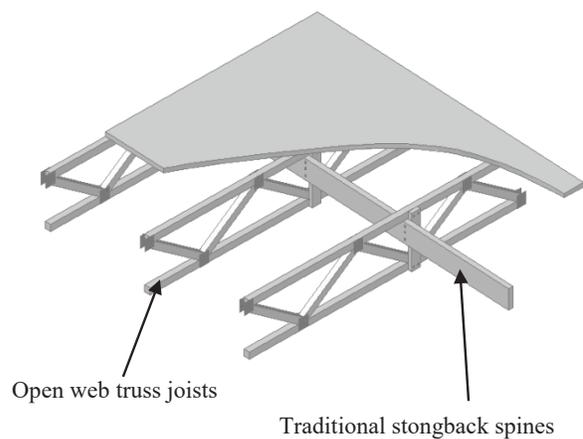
A wood floor with traditional strongbacks in open web truss joists.
